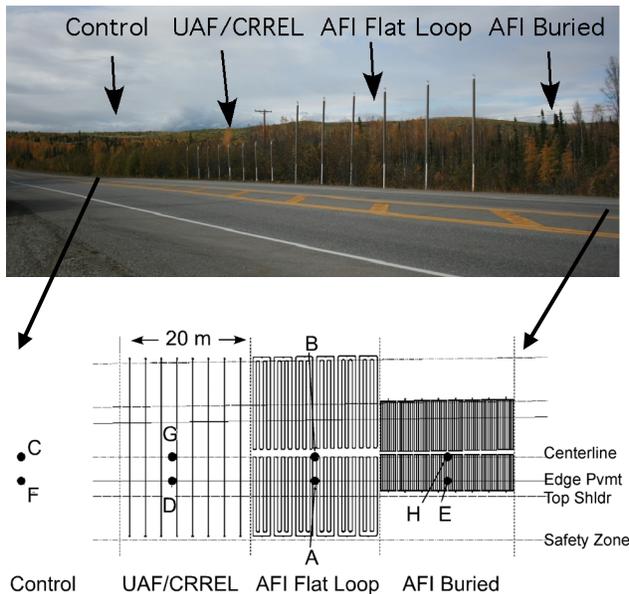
Layout of the installation including the control section, the UAF/CRREL section, the AFI Flat loop section, and the AFI Buried section. Four thermistor strings are located at the center of the roadway (C, G, B, H) and four strings at the edge of the pavement (F, D, A, and E).
